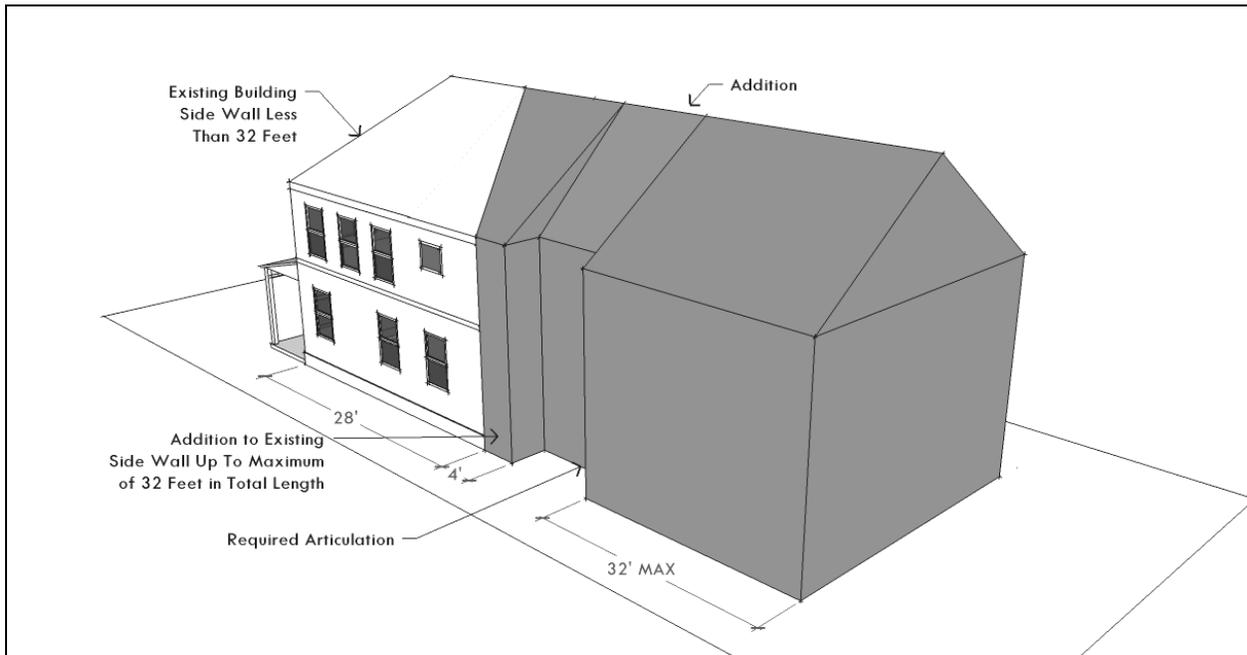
Side Wall Articulation (Existing Side Wall Less Than or Equal to 32 Feet)
